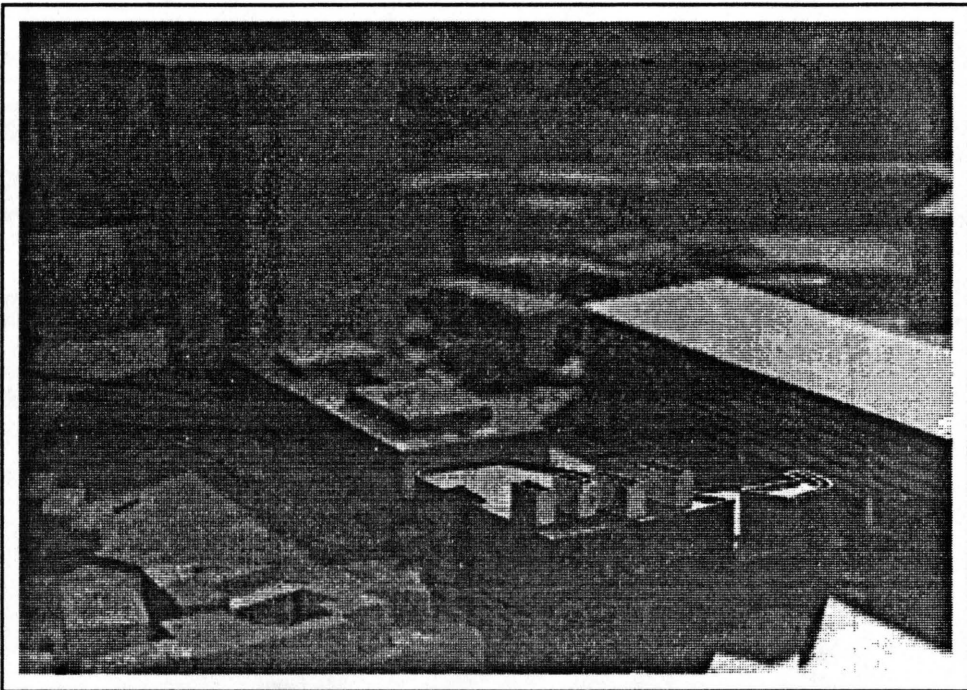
Parcel 7 Vent Building Model : 90 foot building and garage, 115 foot stacks
